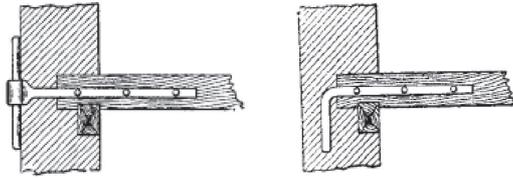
Examples of metal devices use to ensure the connection between the main beams and the masonry wall (Segurado, 1942).
